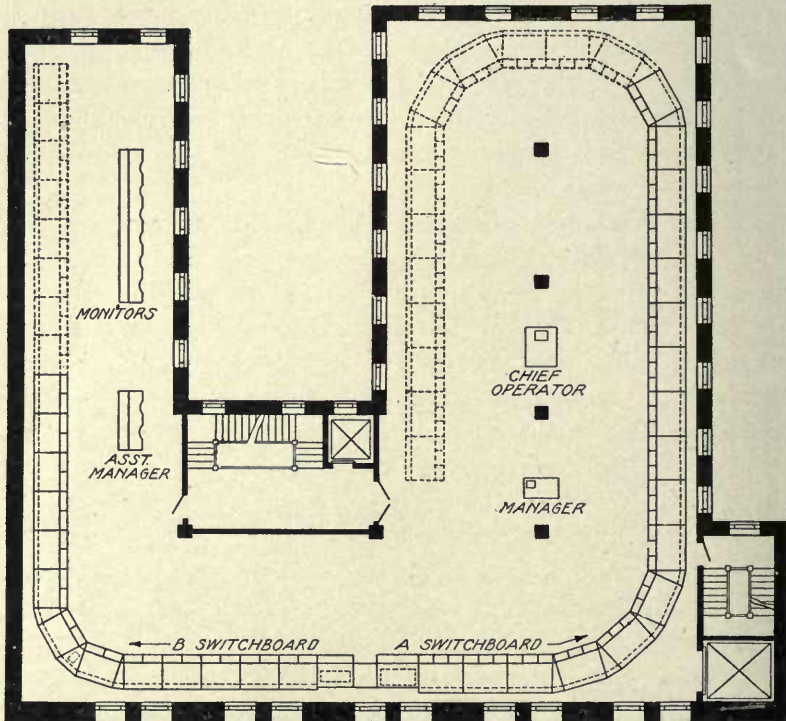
Floor Plan, Operating Room, Chelsea Office, New York City
